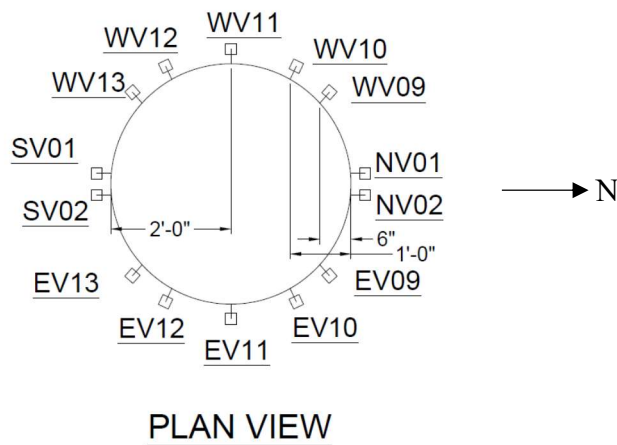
Plan view of linear potentiometers locations around sacrificial zone for Specimen 1
